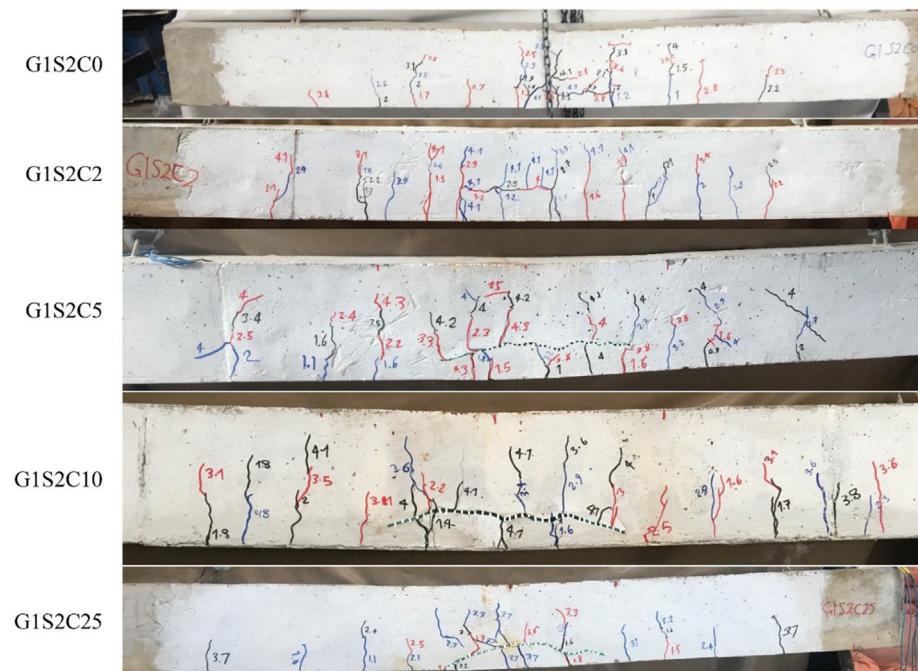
The cracking pattern of specimens 2 stirrups.
